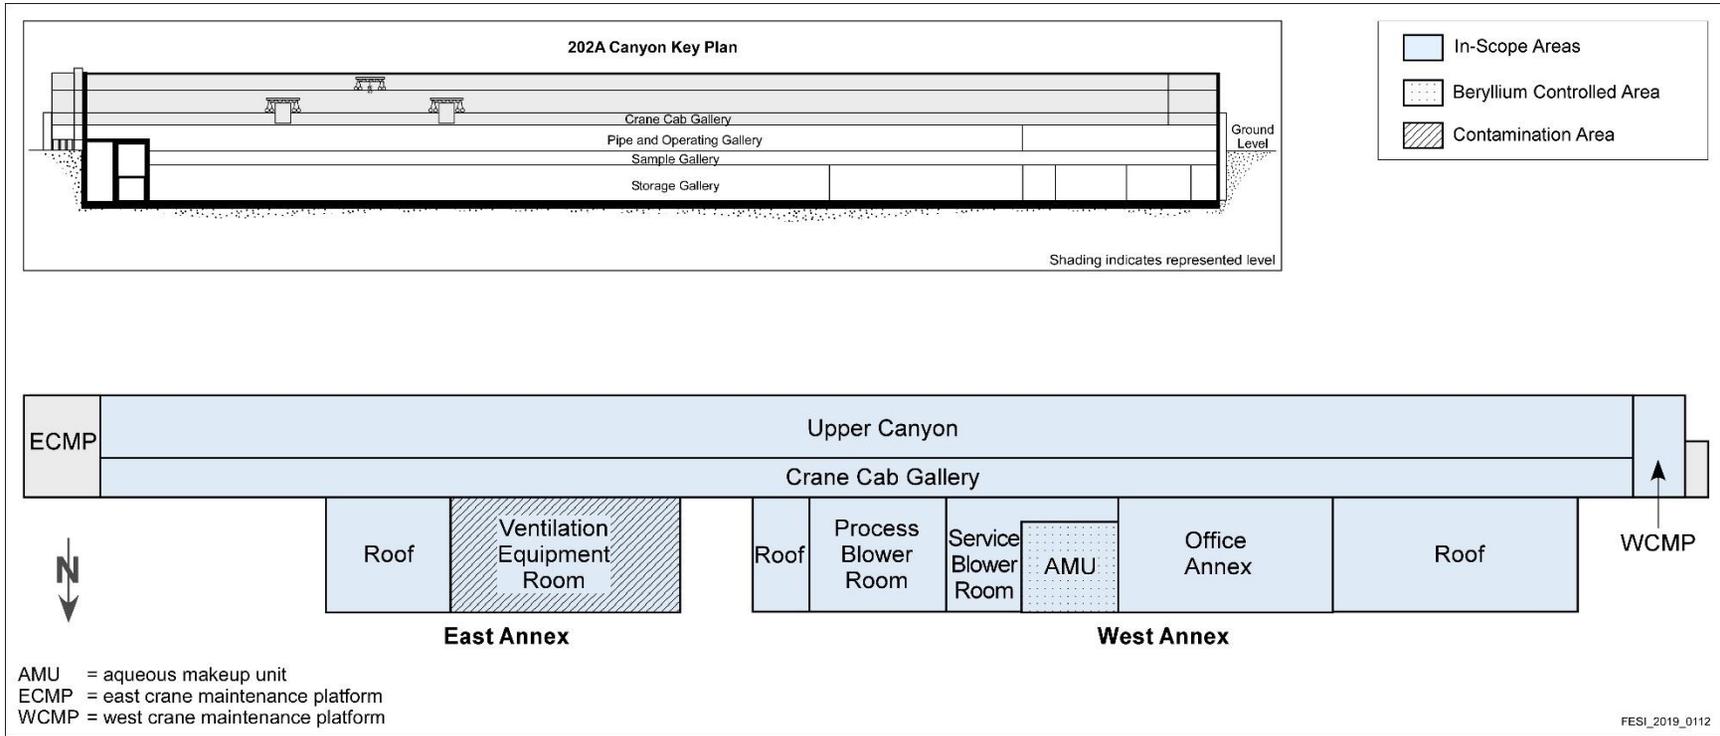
202A Building Plan View – Crane Cab Gallery Level
